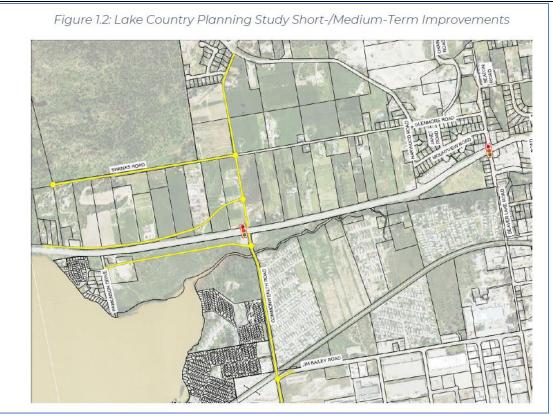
Excerpt from the MoTT Lake Country Planning Study showing the proposed road connection.
